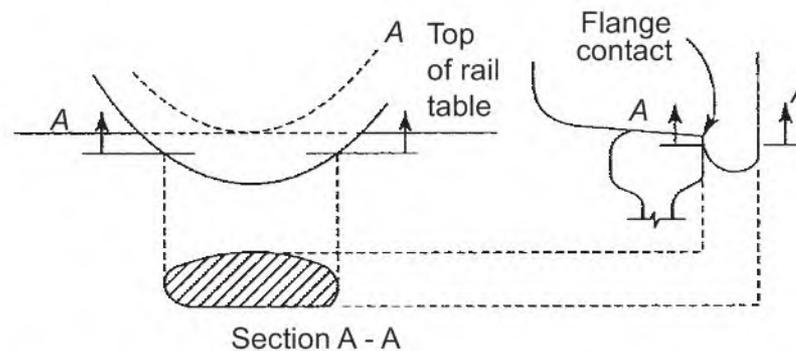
Sectional plan of wheel flange at level of flange-to-rail contact
